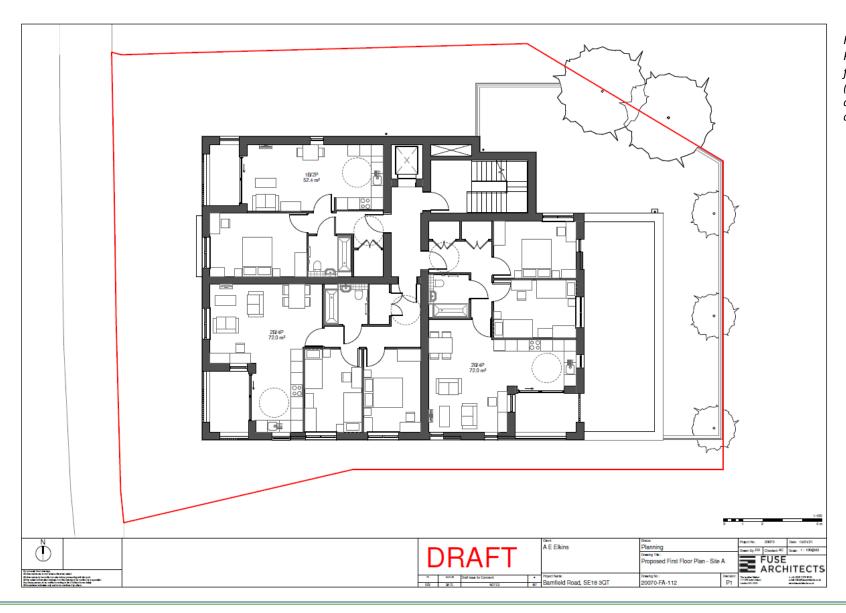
Site A Proposed first floor plan (Reproduced by courtesy of the client)
